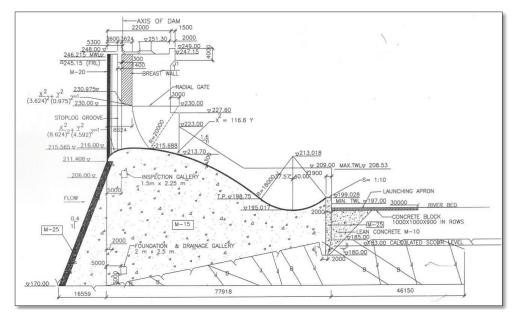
Cross section of original design of orifice spillway for Pare H. E. Project, Arunachal Pradesh
